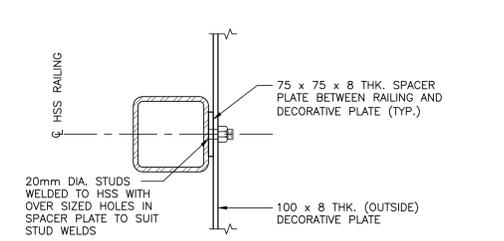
DETAIL - DECORATIVE RAILING EXPANSION CONNECTION
